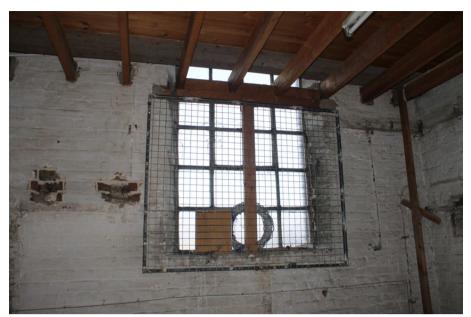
Herringbone strutting supporting first-floor of Structure 7. Photograph taken facing south.
